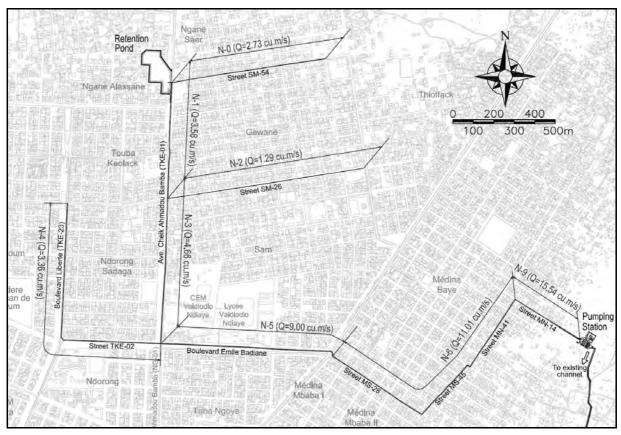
Proposed Route and Design Discharge for New Drainage Box Culvert
